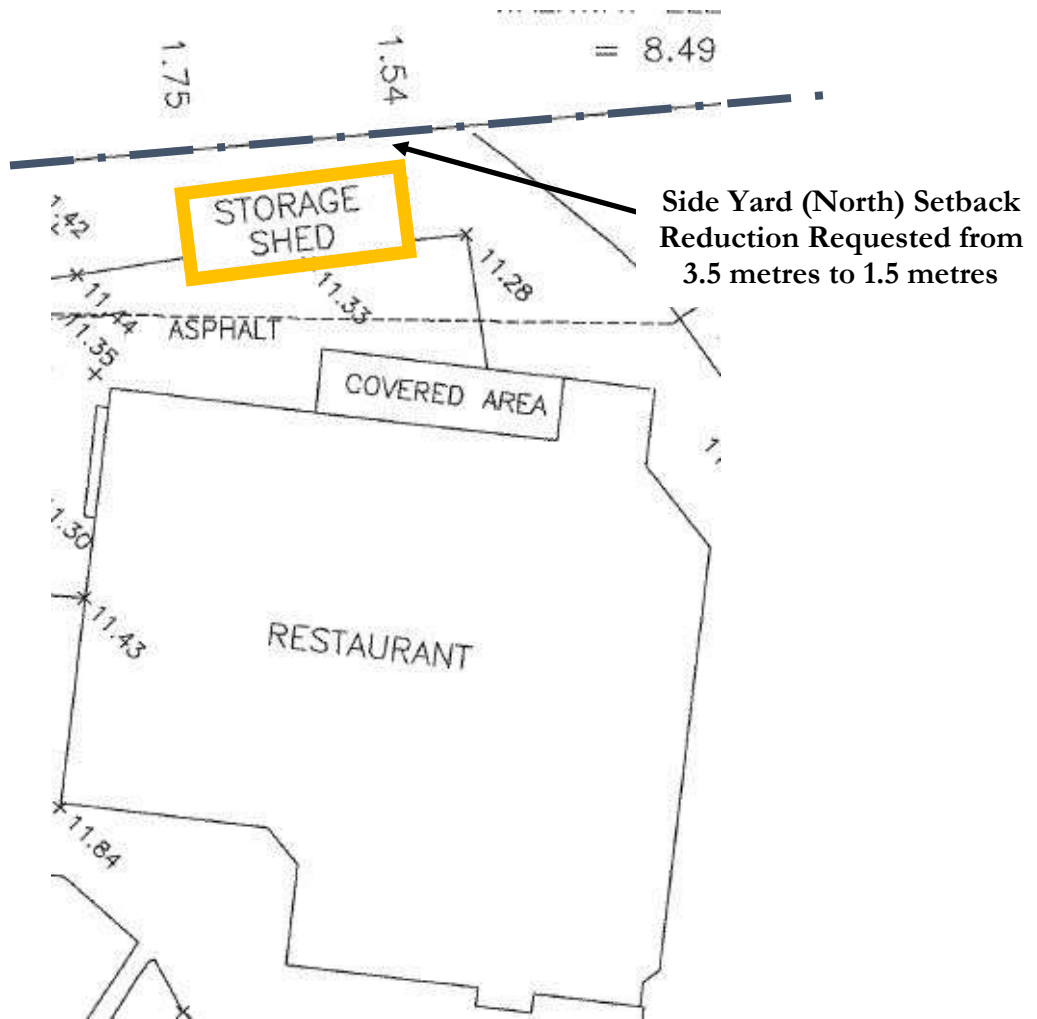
Side Yard (North) Setback Reduction Request for the Existing Storage Shed
